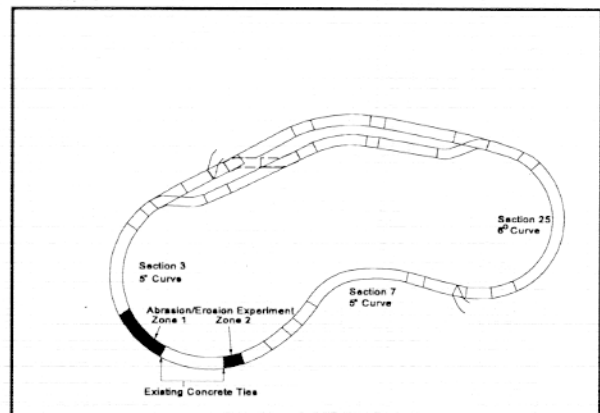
Rail Seat Abrasion Test Zones at FAST
